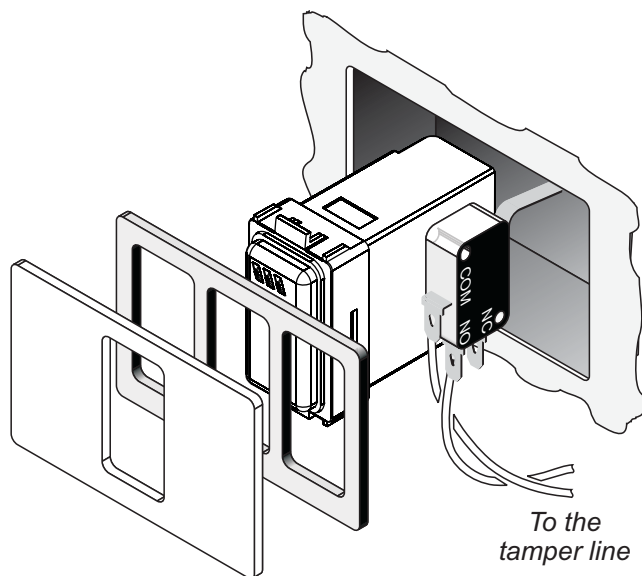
Mounting Key Readers ECLIPSE2 Magic type
